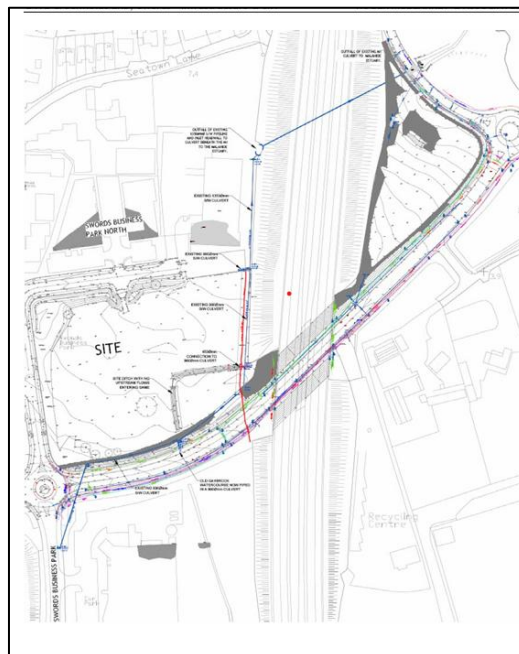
Existing S/W Culvert on the Proposed Development Site (Roger Mullarkey & Associates, 2026)
